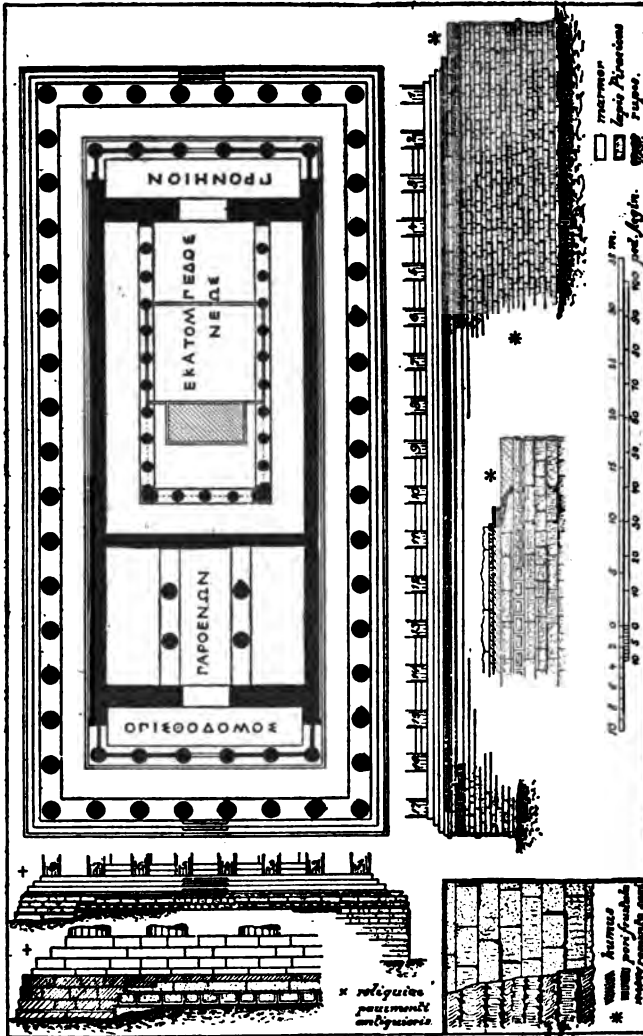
Ground-plan of Parthenon. Foundation Walls.
